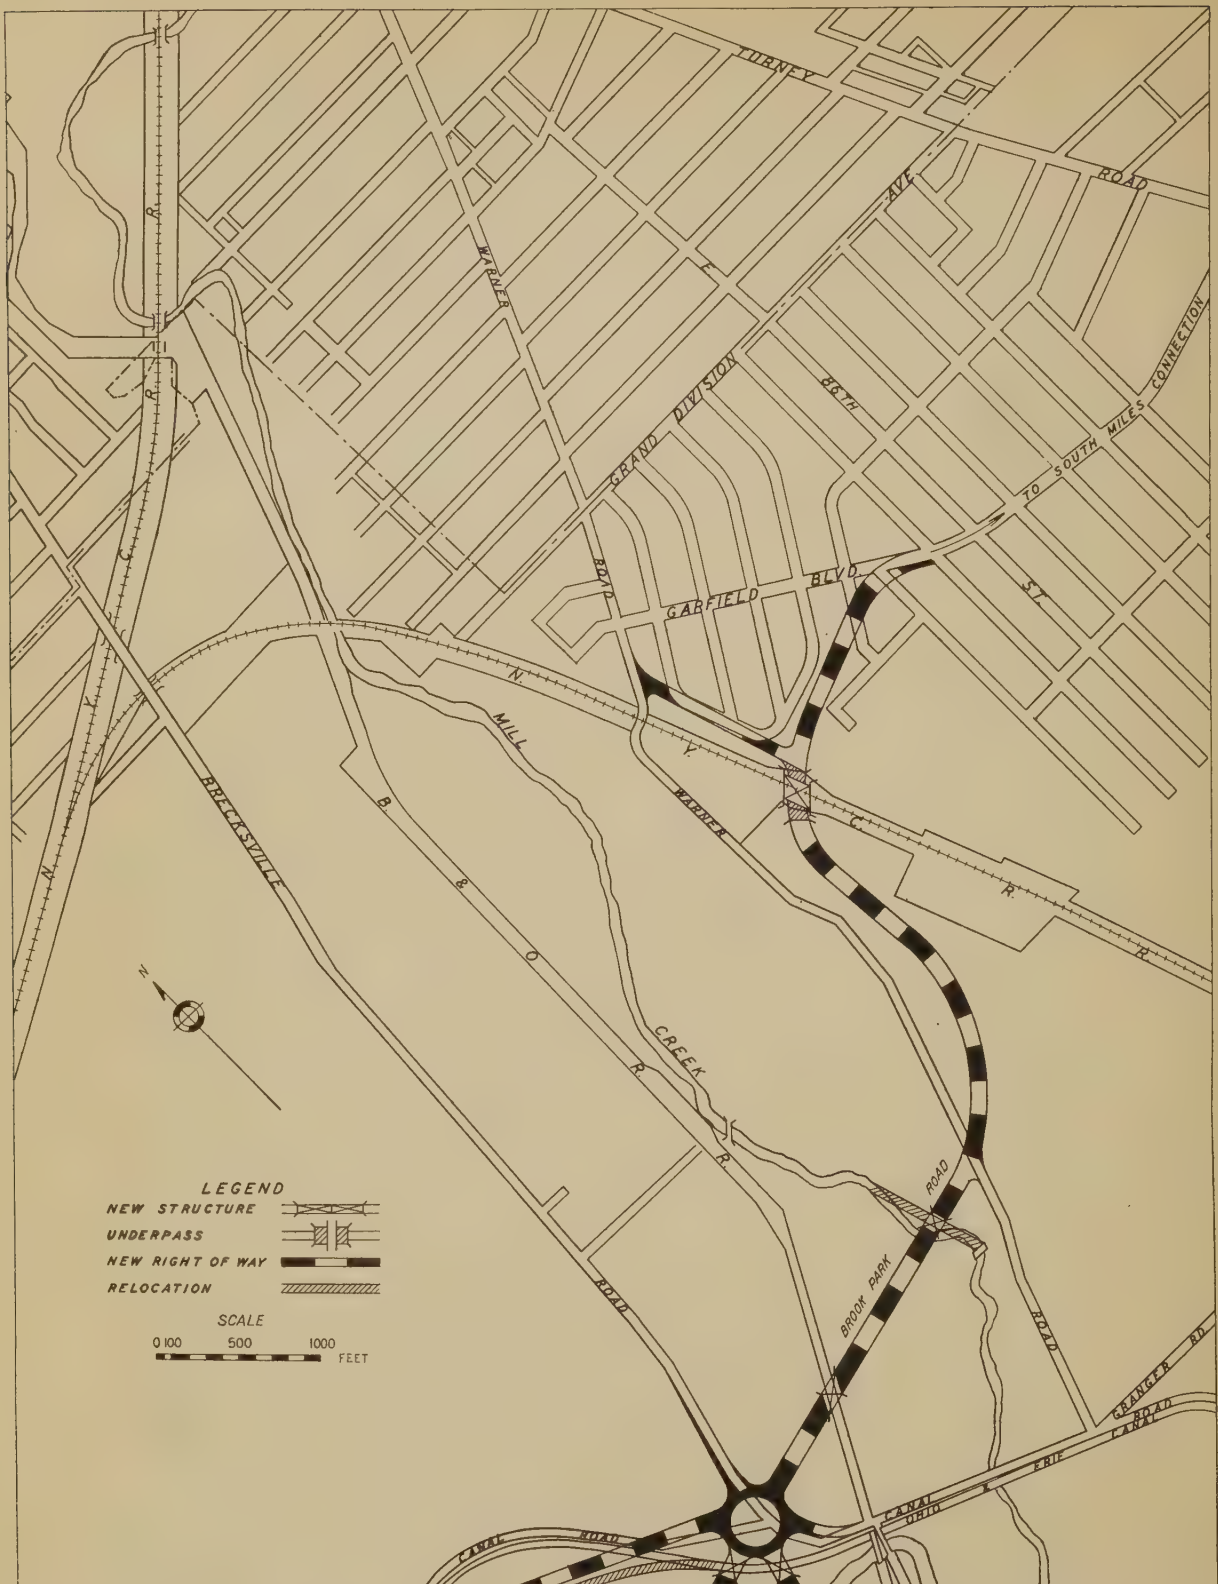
H.—East of and partially overlapping area of Figure 8G, showing Willow Circle with Brook Park Belt Road connection to Garfield Boulevard and Warner Road relocation
